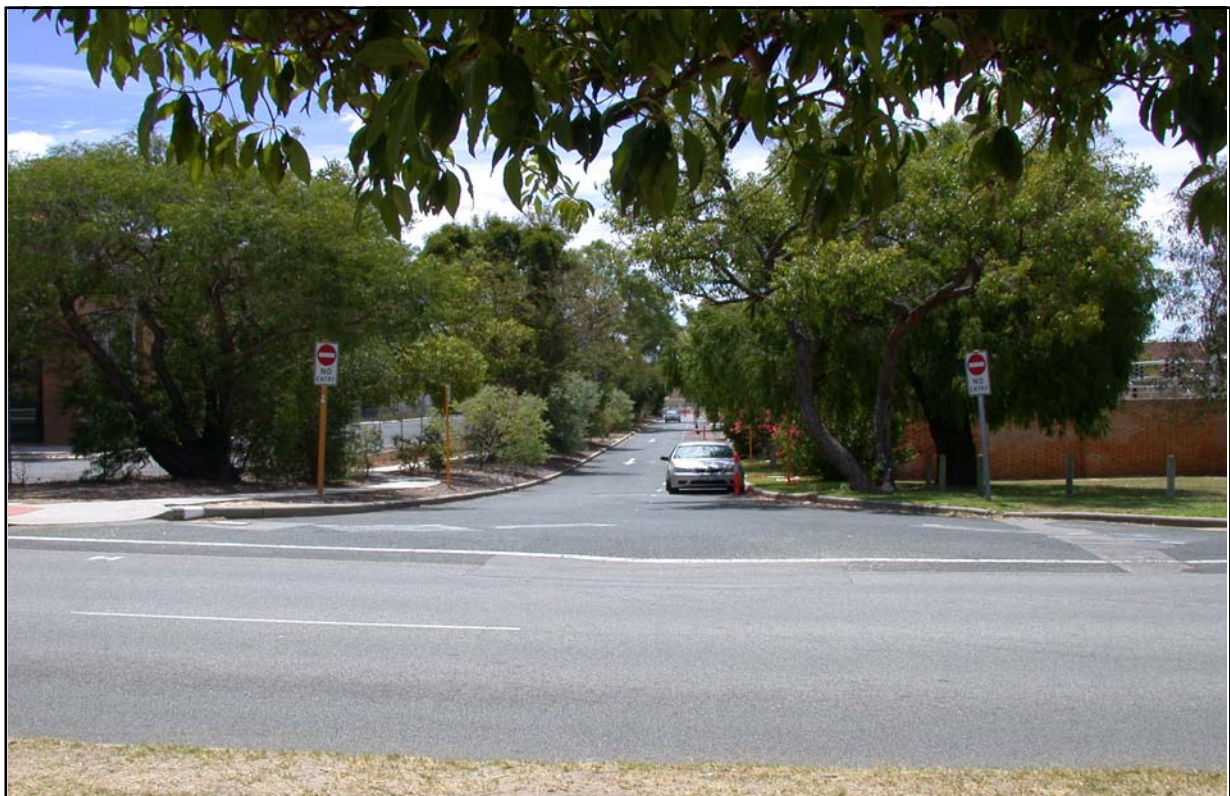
View east along Monash Avenue from Hampden Road at the roundabout.
